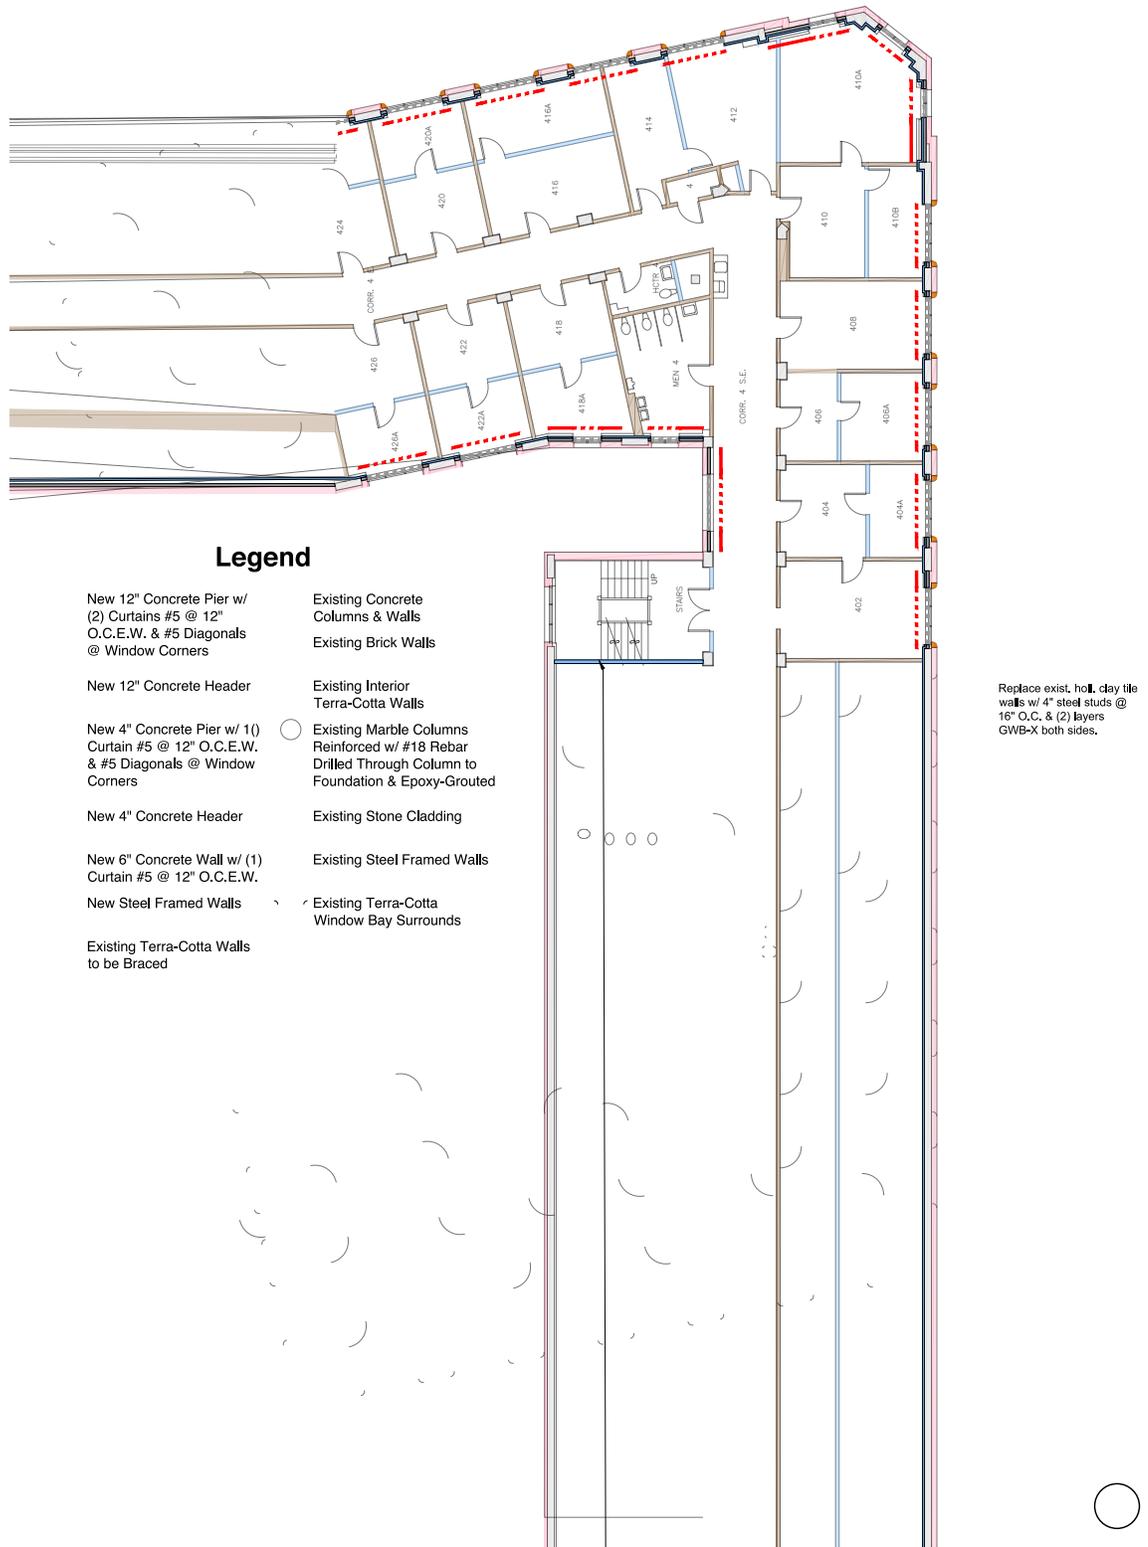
(6): Recom. HCT Wall Bracing/Replacement Locations-Floor Level 4
